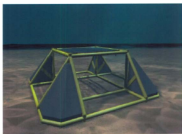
GravitySubsea Protection (GSP) Frame (Arup Energy, 2008)
